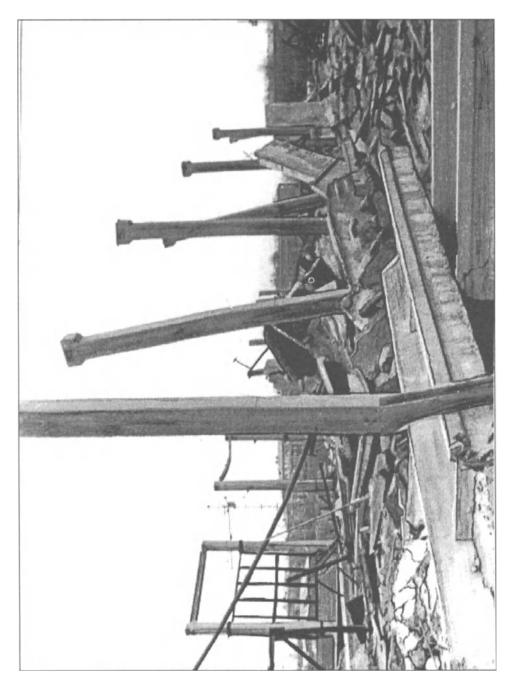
Damage to Magnitoprovod plant industrial pre-cast frame building in Leninakan.
